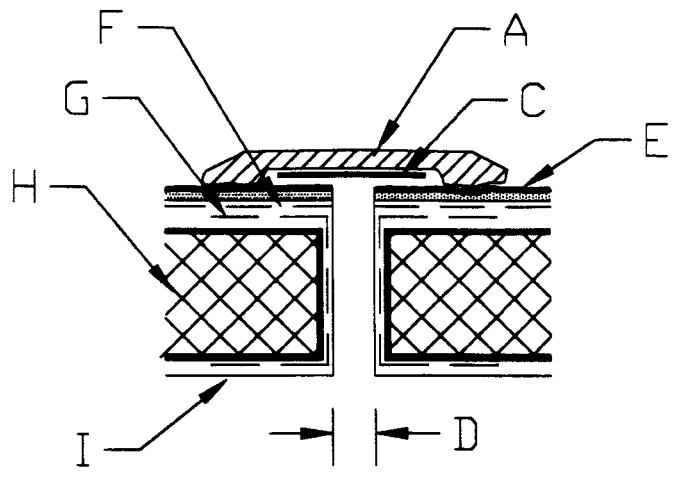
Recessed Sealant Butt Joint Seal (EIFS to EIFS)
